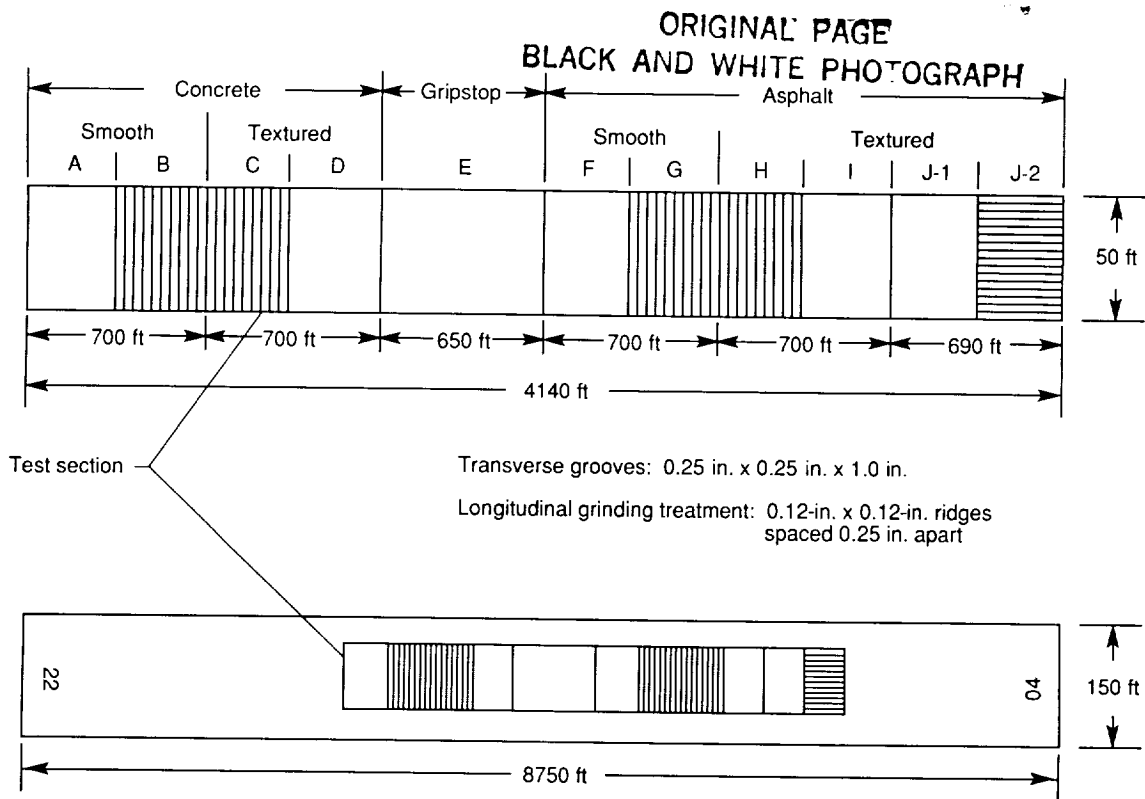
Schematic of runway 4/22 test surfaces at Wallops Flight Facility.
